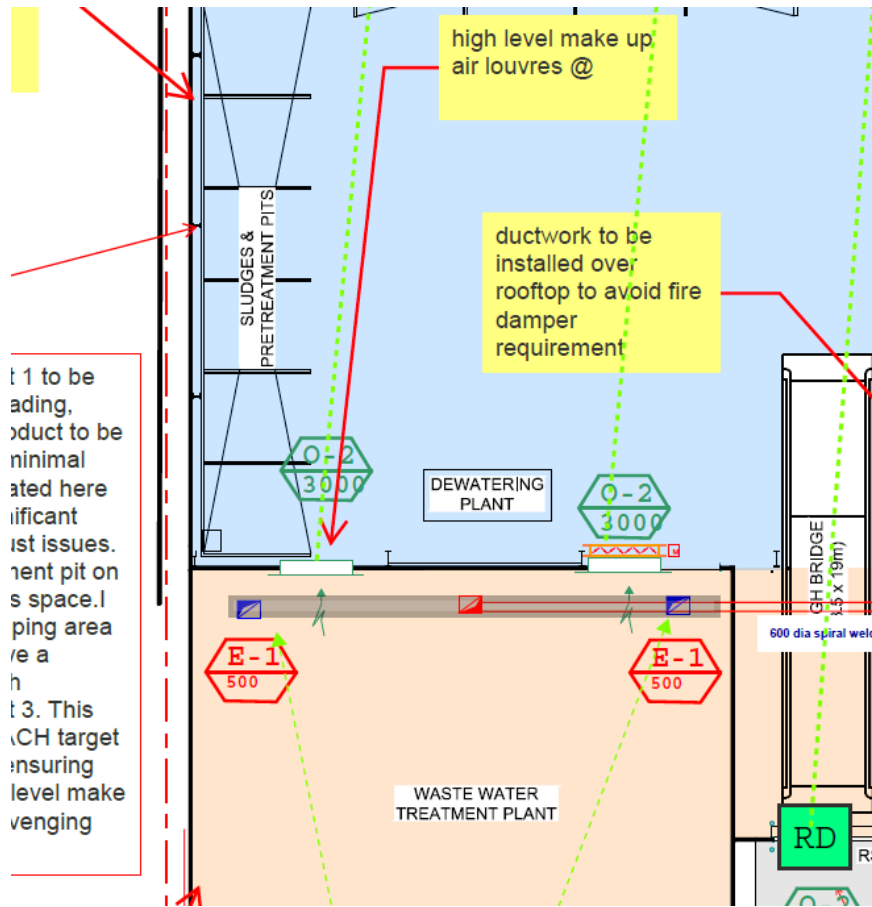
Makeup Air Louvres Located in 240/240/240 FRL Wall – Louvres to be Relocated or Provided with Fire Dampers
